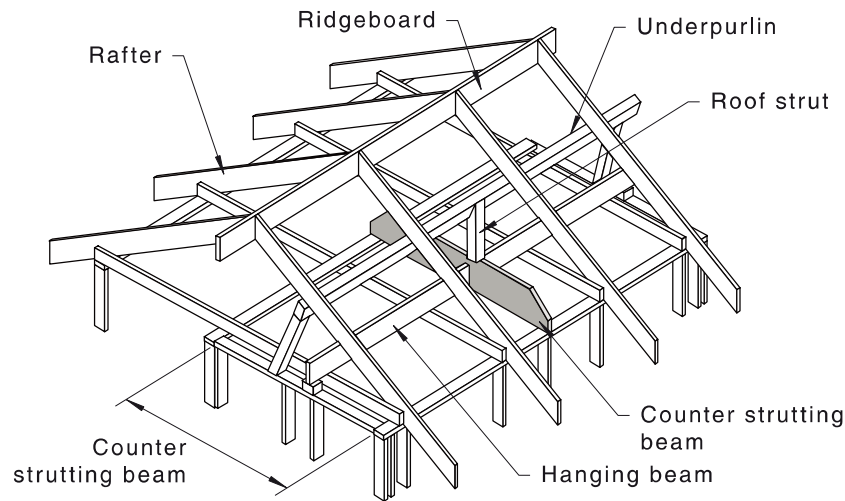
COUNTER STRUTTING BEAM
